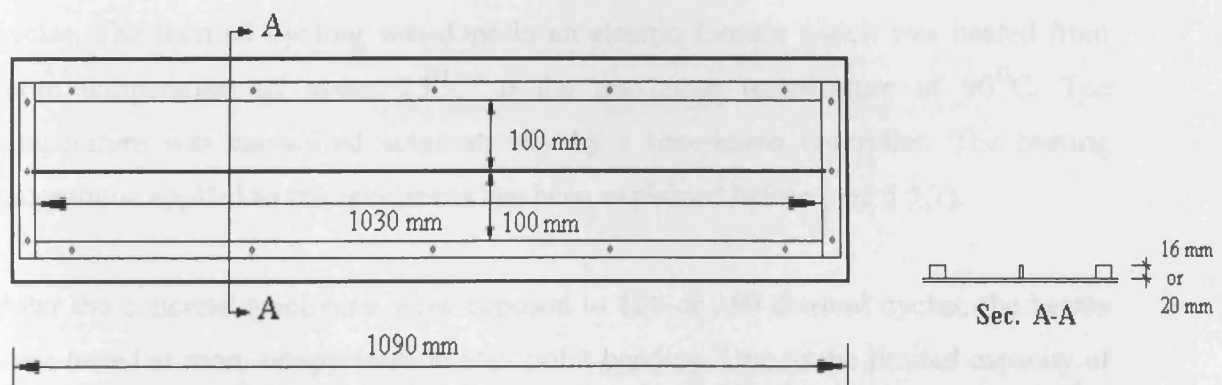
Steel moulds to cast two CARDIFRC[®] strips, 16 or 20 mm thick
